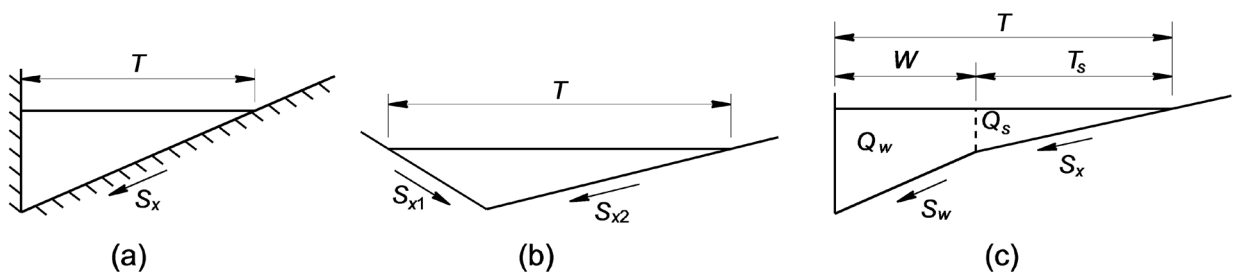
Typical Gutter Cross Sections - (a) Vertical Leg Triangle, (b) Single Cross-Slope Triangle, (c) Two Cross-Slope Triangle
